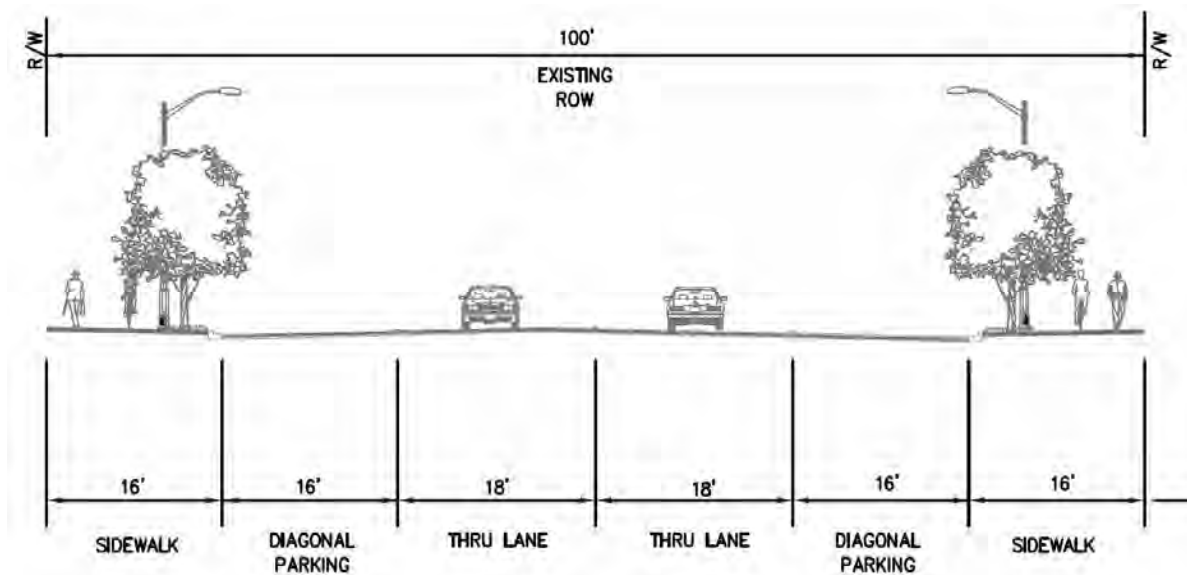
Proposed Cross Section, 3rd Avenue With Diagonal Parking
